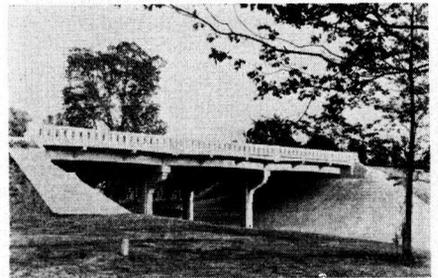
Precast Concrete Slope Protection. Courtesy of Portland Cement Assn.
